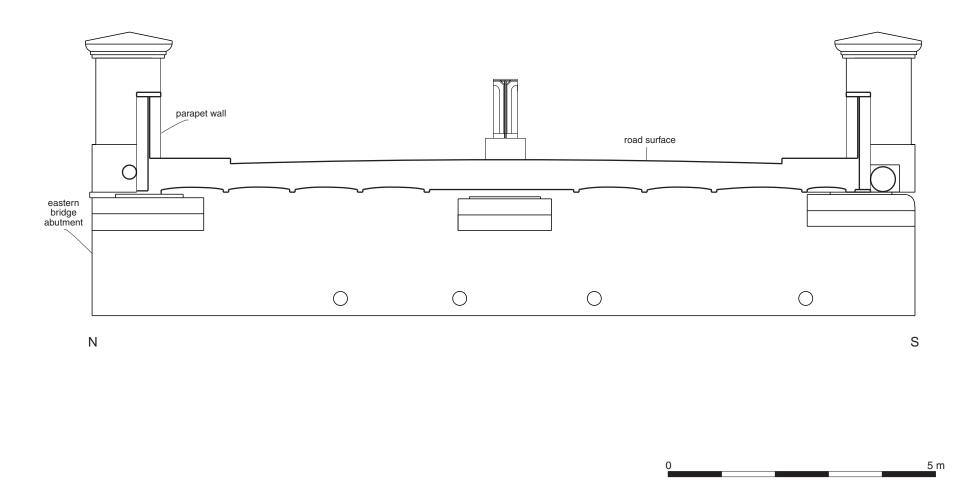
West-facing sectional elevation through White Post Lane Bridge
